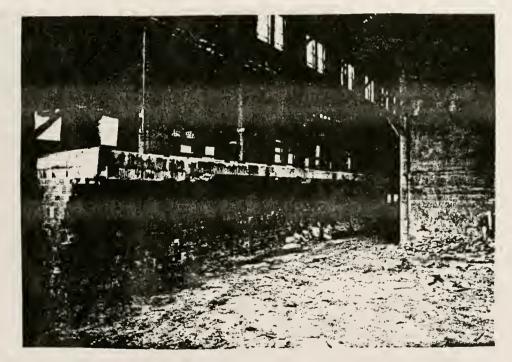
Arsenic plant (structure #59). Interior view showing the east wall of the primary kitchen and the remains of the secondary kitchen which ran parallel to it. At right is the newer concrete tower.
